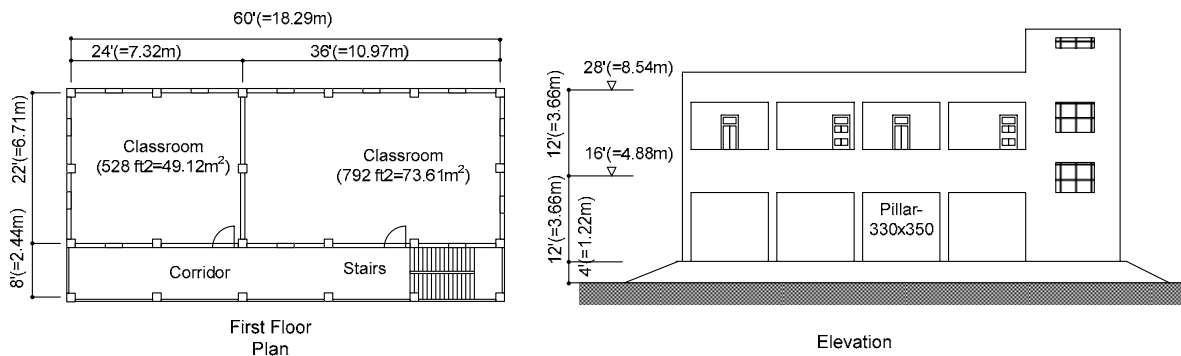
Cyclone Shelter Plan of the Metta Foundation (Example)
